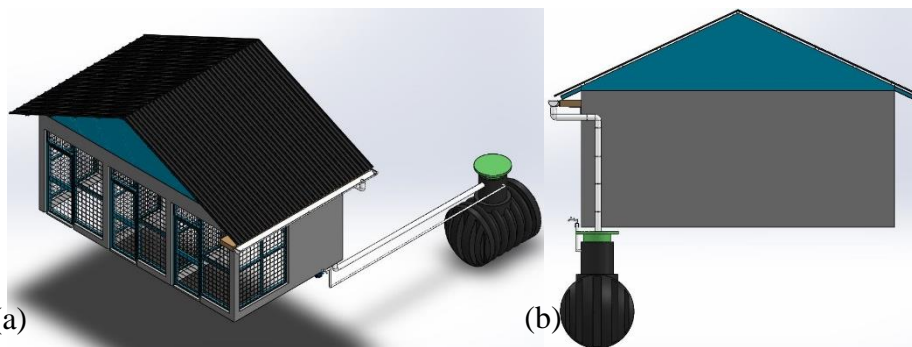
(a) Isometric View and (b) Rear View of a Building after Implementing the Direct-Pumped System.
